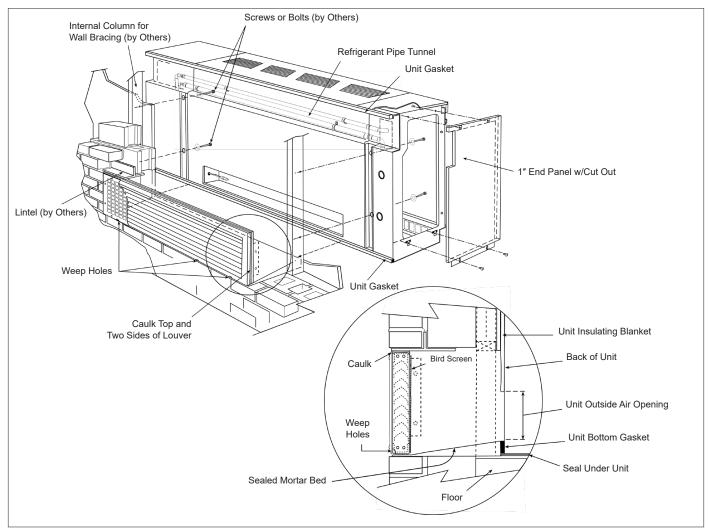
Typical Classroom Unit Ventilator Installation and Louver Details
